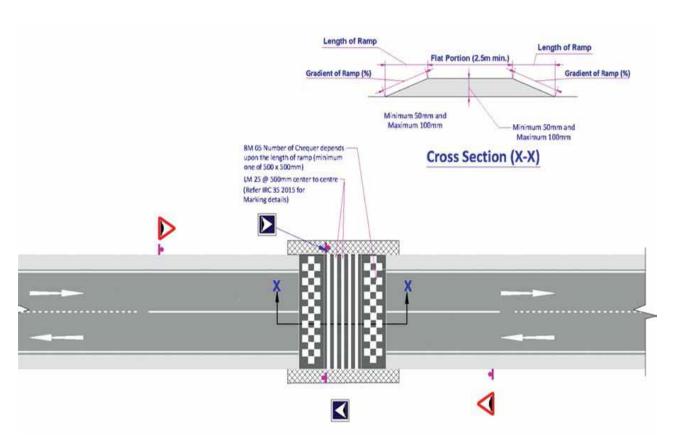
geometric details of trapezoidal road hump IRC 99-2018
